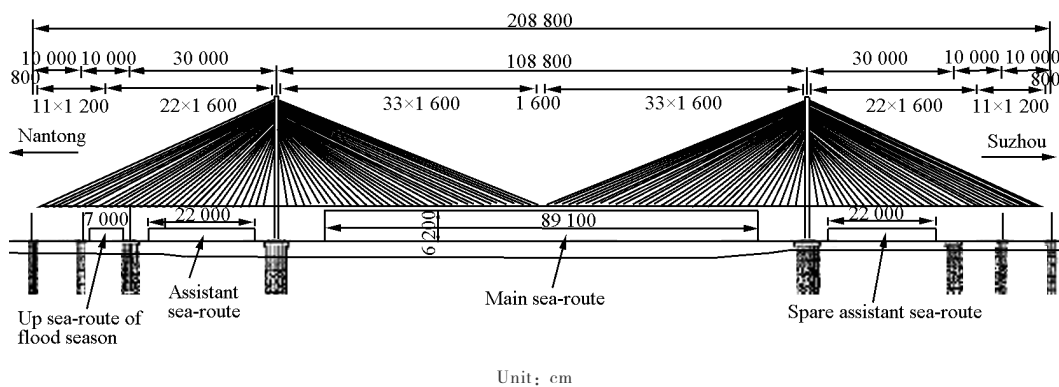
Main bridge schematic diagram of Sutong Bridge
